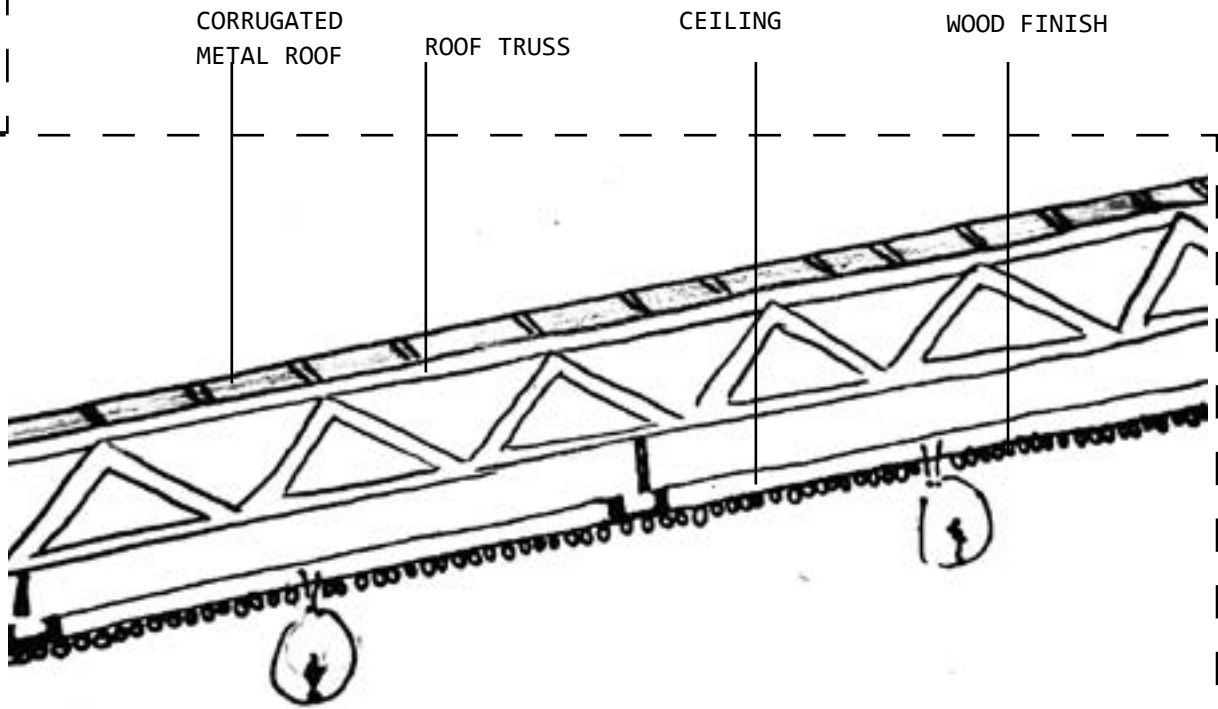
N: [DETAIL 7] Suspended acoustics ceiling (Author, 2021)
